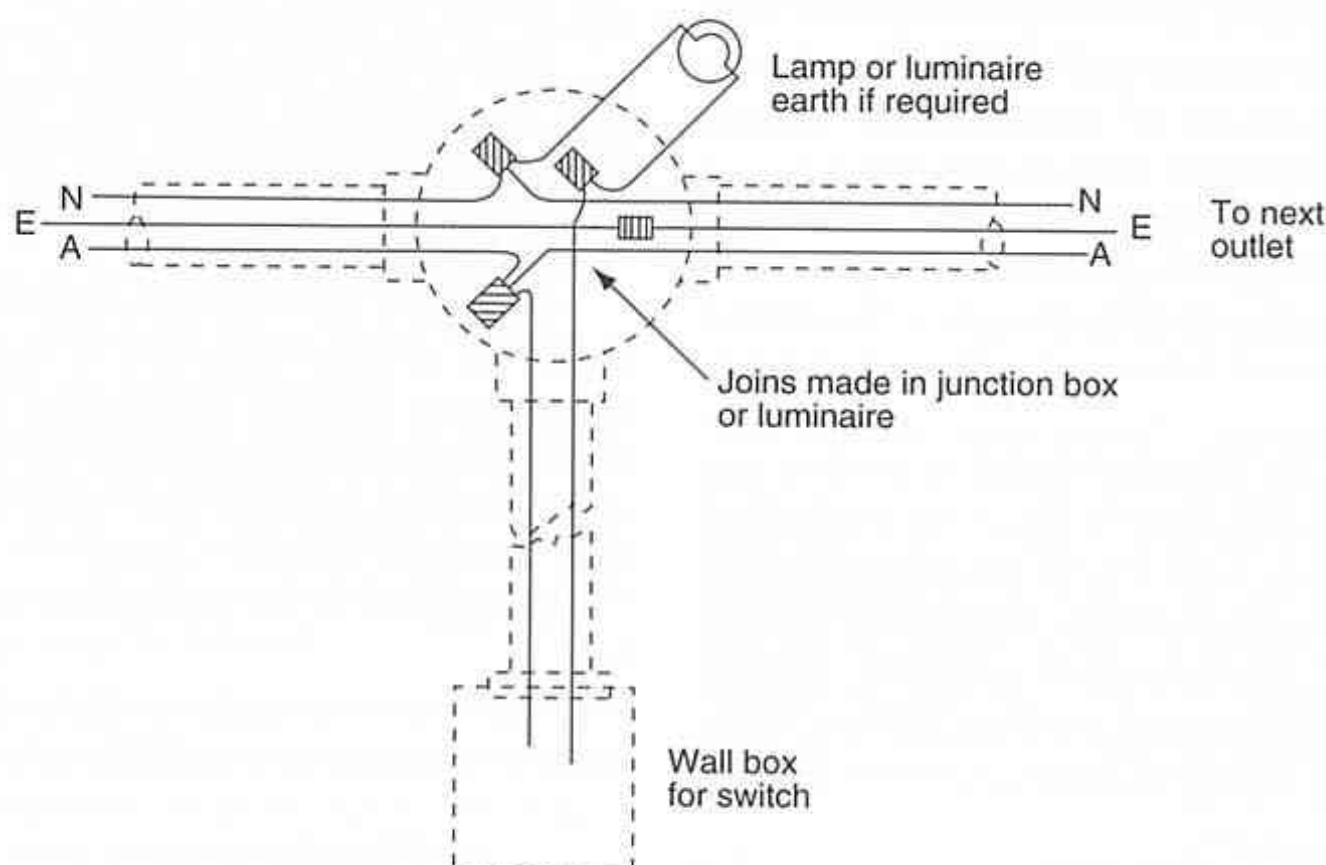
Looping-in at accessible junction box or luminaire in a conduit system buried in concrete
